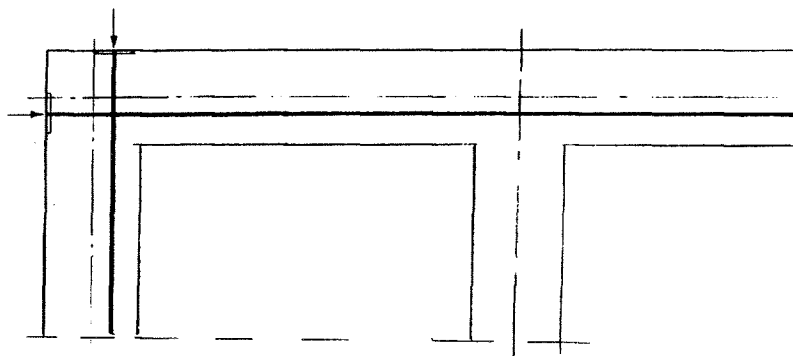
Eccentric placement of the prestressing steel reinforcement.
